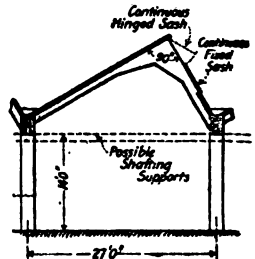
Reinforced-concrete Sawtooth Roof Truss.
